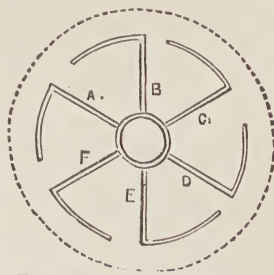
TRANSVERSE SECTION OF PIGEON-HOUSE.
